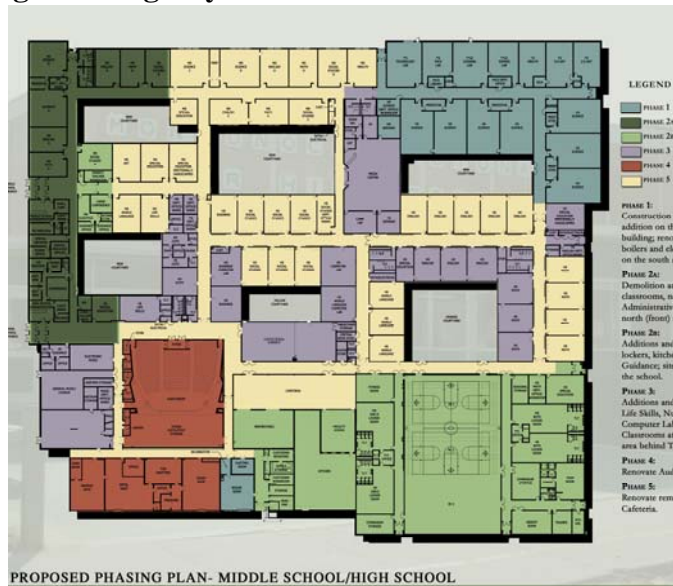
Example of Traditional Phasing Plan (www.mrsd.org)
